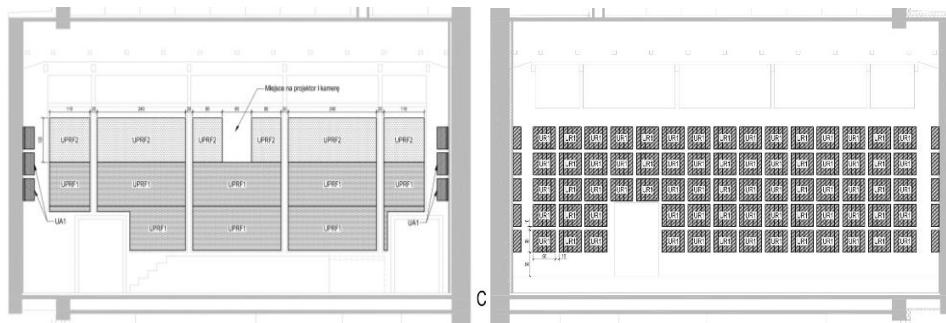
Section view of the back wall (left) and front wall (right) of the measured concert hall
